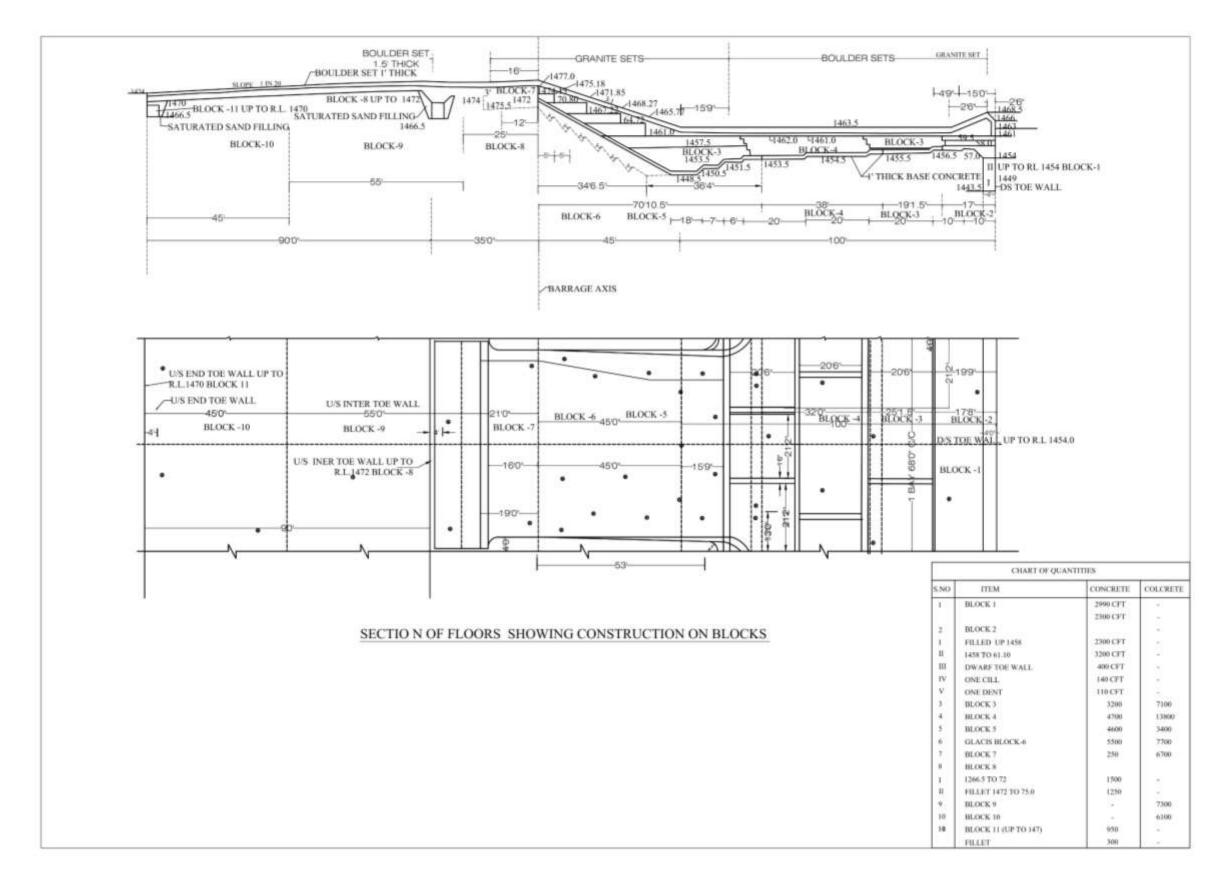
Section through Under sluice bays of Dakpathar Barrage
